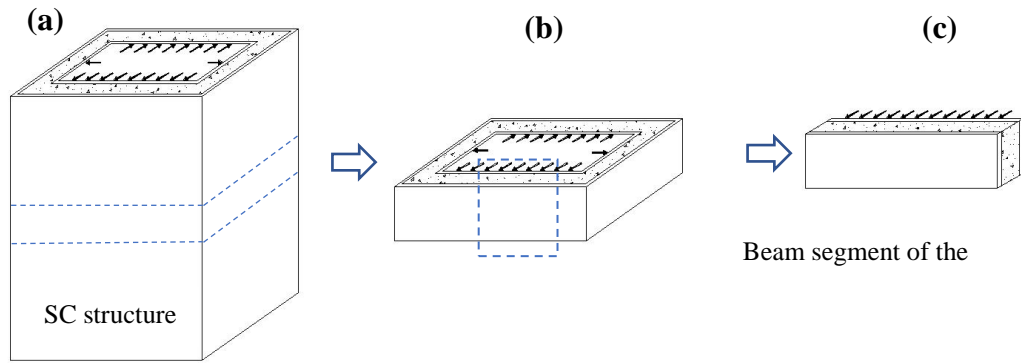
Schematic sketch of beam subsection taken from structural wall (drawing is not to scale)
